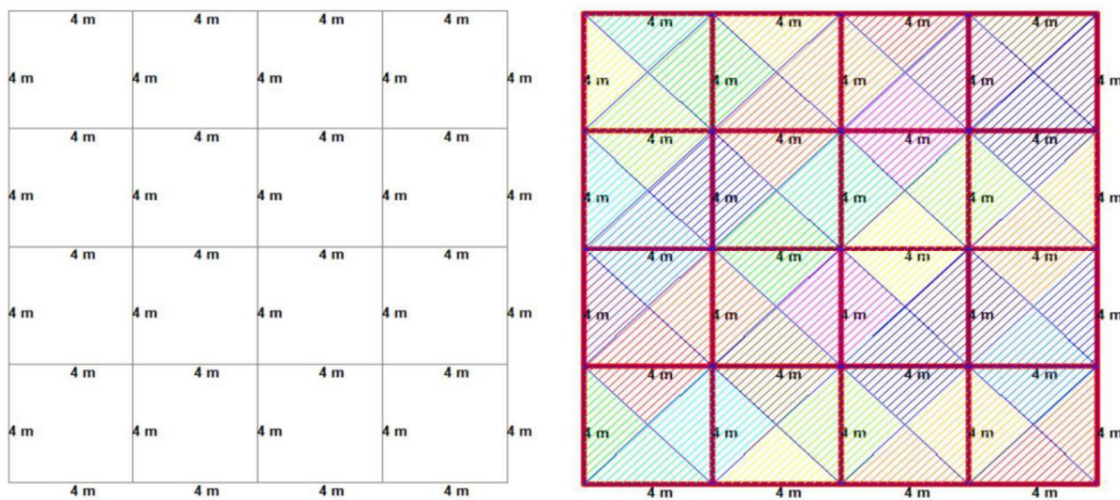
Plan of Building with and without Loading Distribution Generated in STAAD Pro
